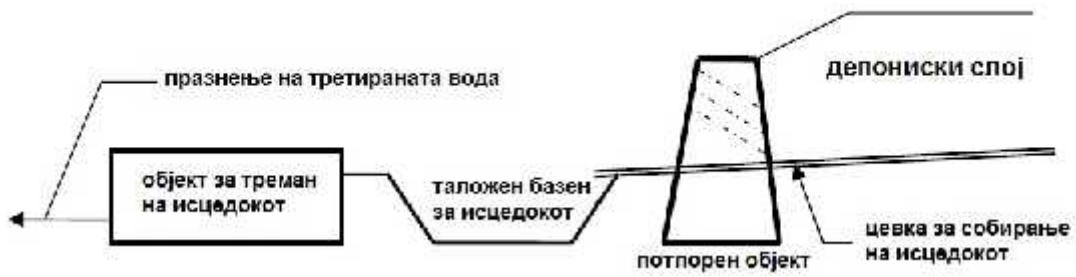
Construction of leachate collection pipes and gas venting pipes with retention pit inside landfill
